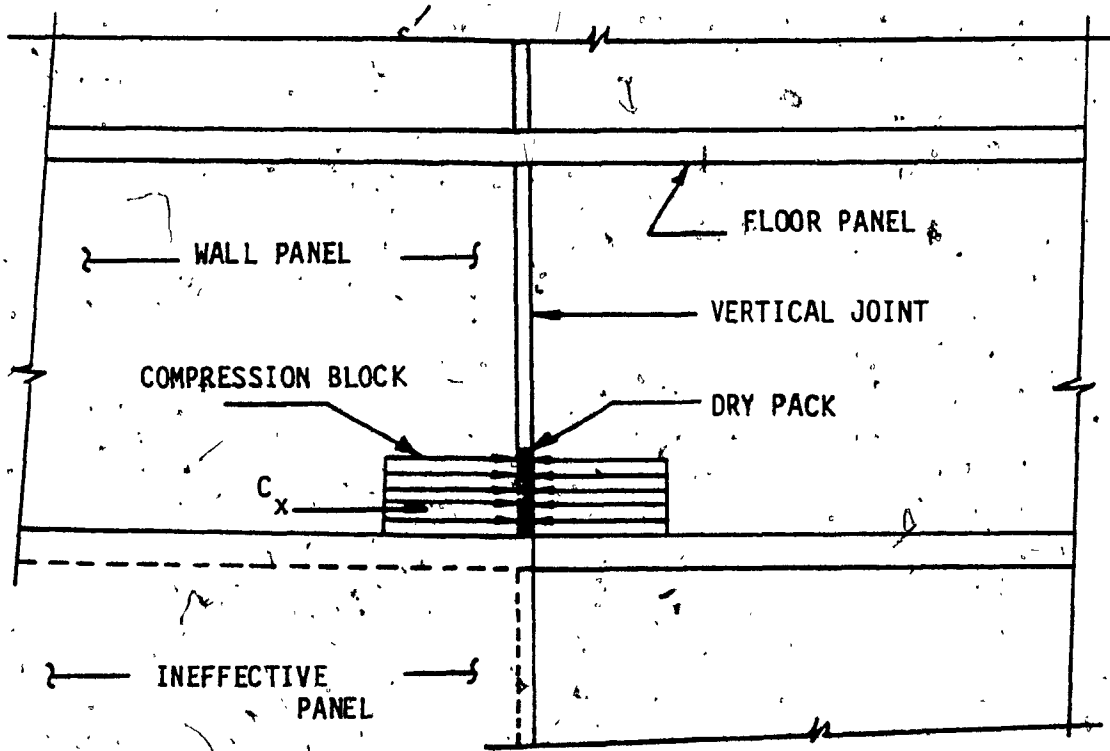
LOCATION OF COMPRESSION BLOCK IN CANTILEVER MECHANISM, (REF.2)
